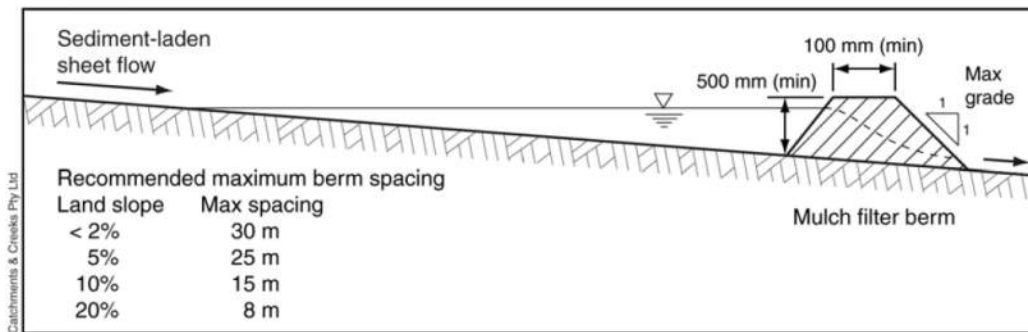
Mulch Filter Bund Typical Section & Placement Details (Source: Catchments and Creeks)
